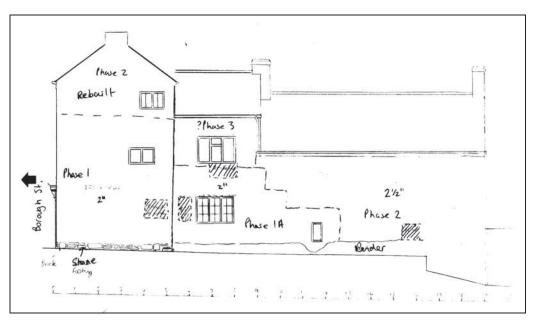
North elevation (adjacent to Co-op Supermarket) showing proposed building phases. The hachured areas denote bricked-in windows.
